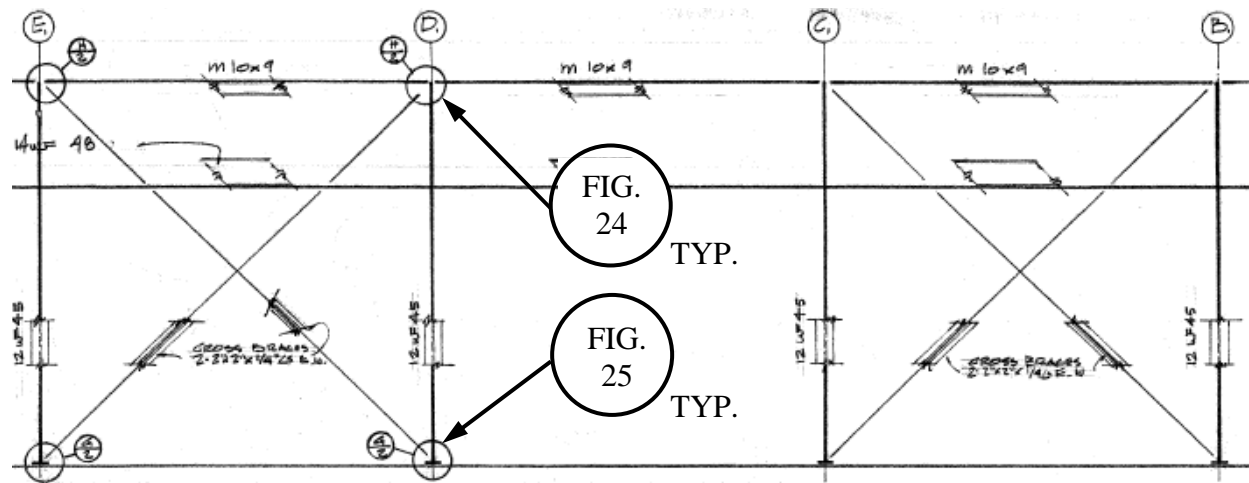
Increment 2 – East and West Braced Frame Elevations
